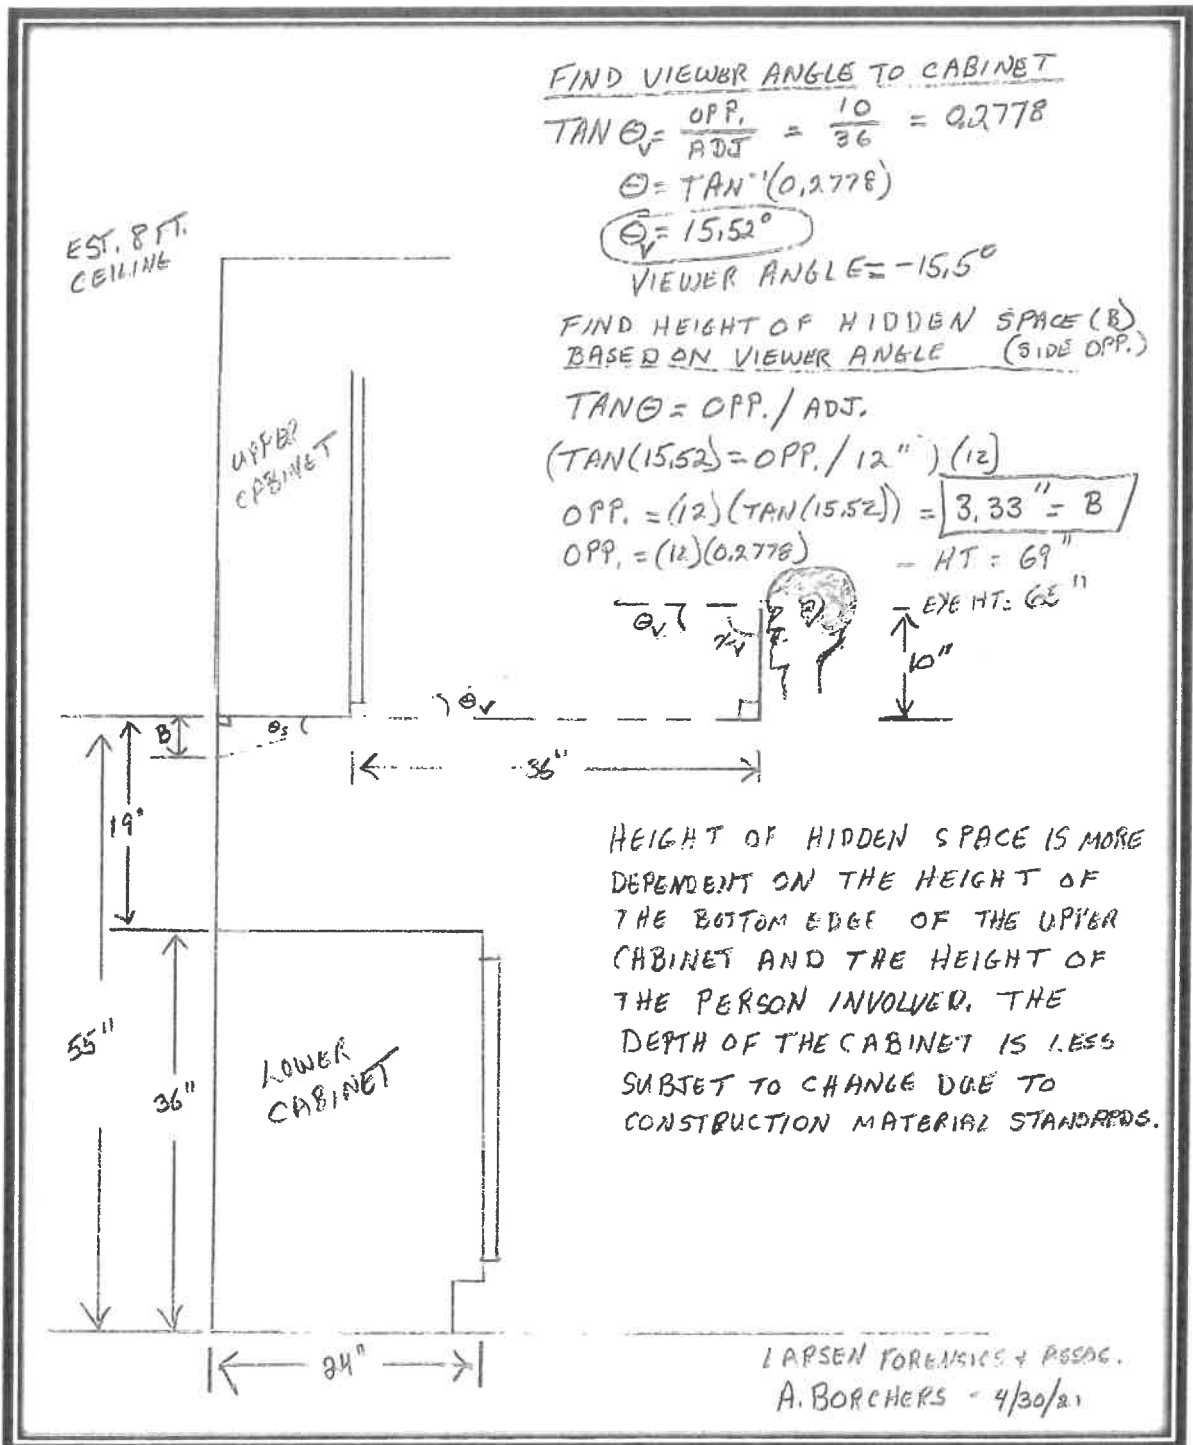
Estimated view angles related to east wall bullet impact and vertical height of hidden section.
